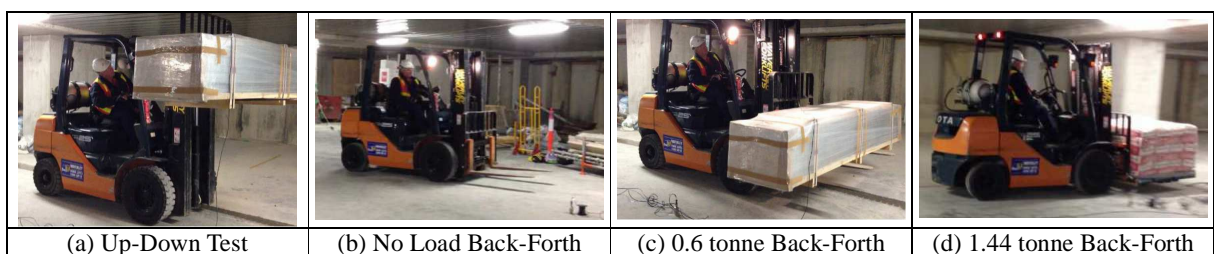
Vibration Tests on Toyota SAS 25 Forklift Truck on Floor in Building under Construction
